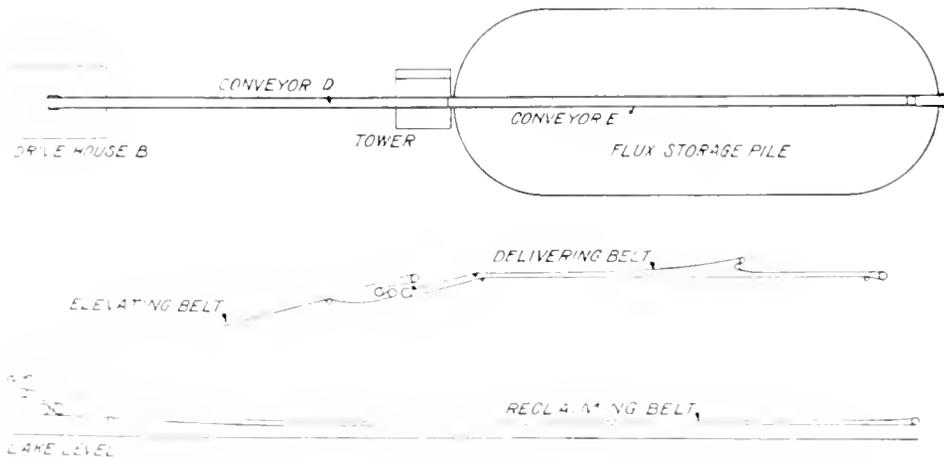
Plan and Elevation Showing Arrangement of Delivering and Reclaiming Belts of the Storage System
